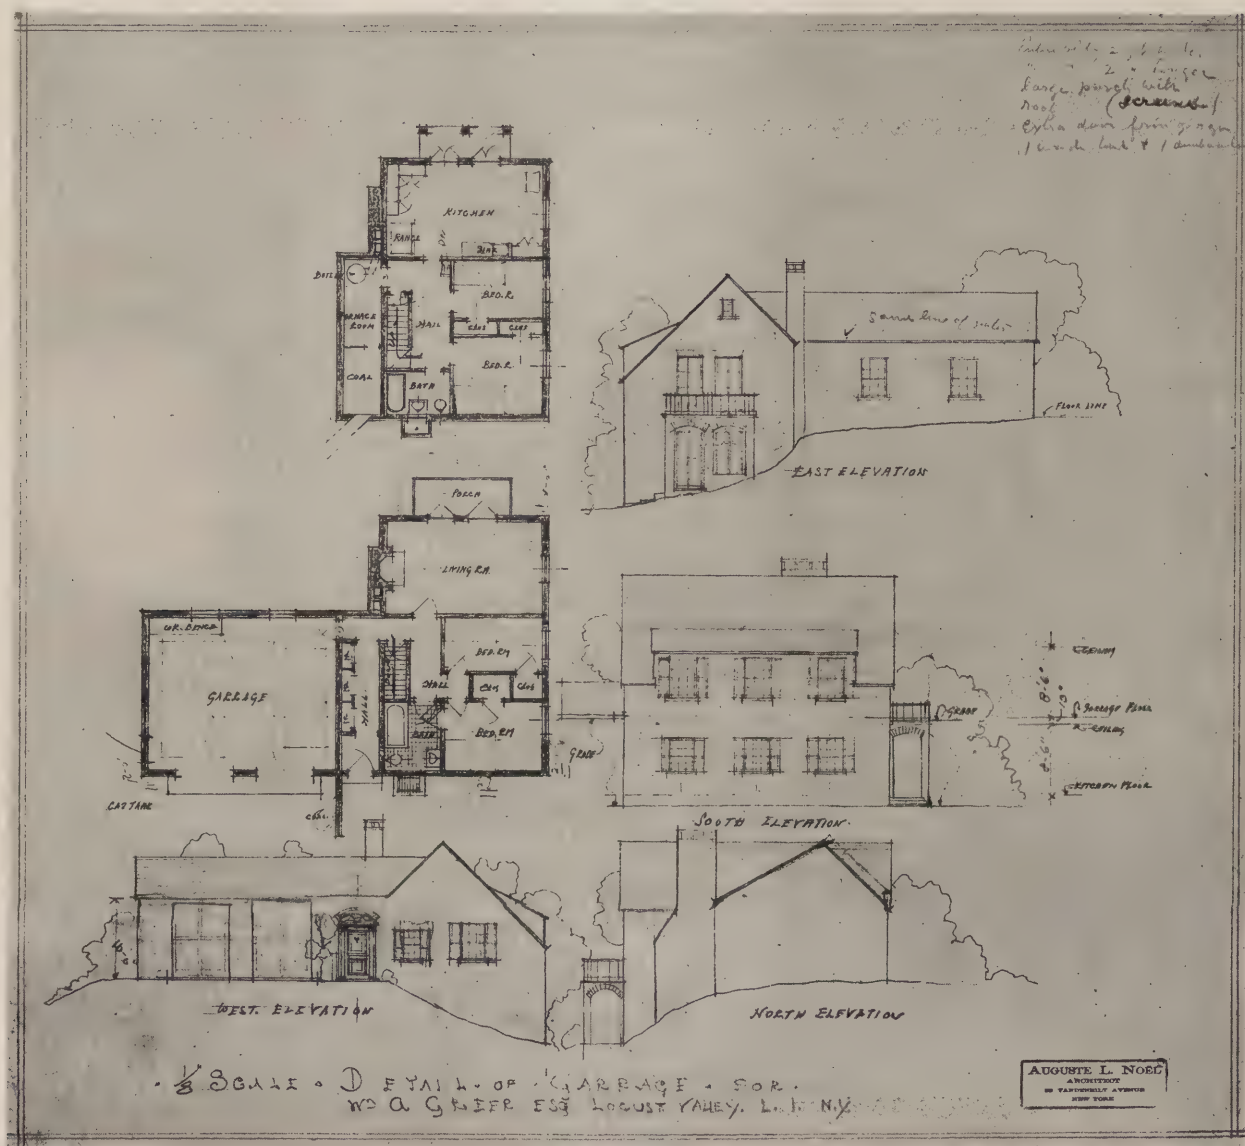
Sheet of Sketch Drawings Showing Plan and Elevation of Garage-House for William A. Greer, Esq., Locust Valley, N. Y. Auguste L. Noel, Architect.
